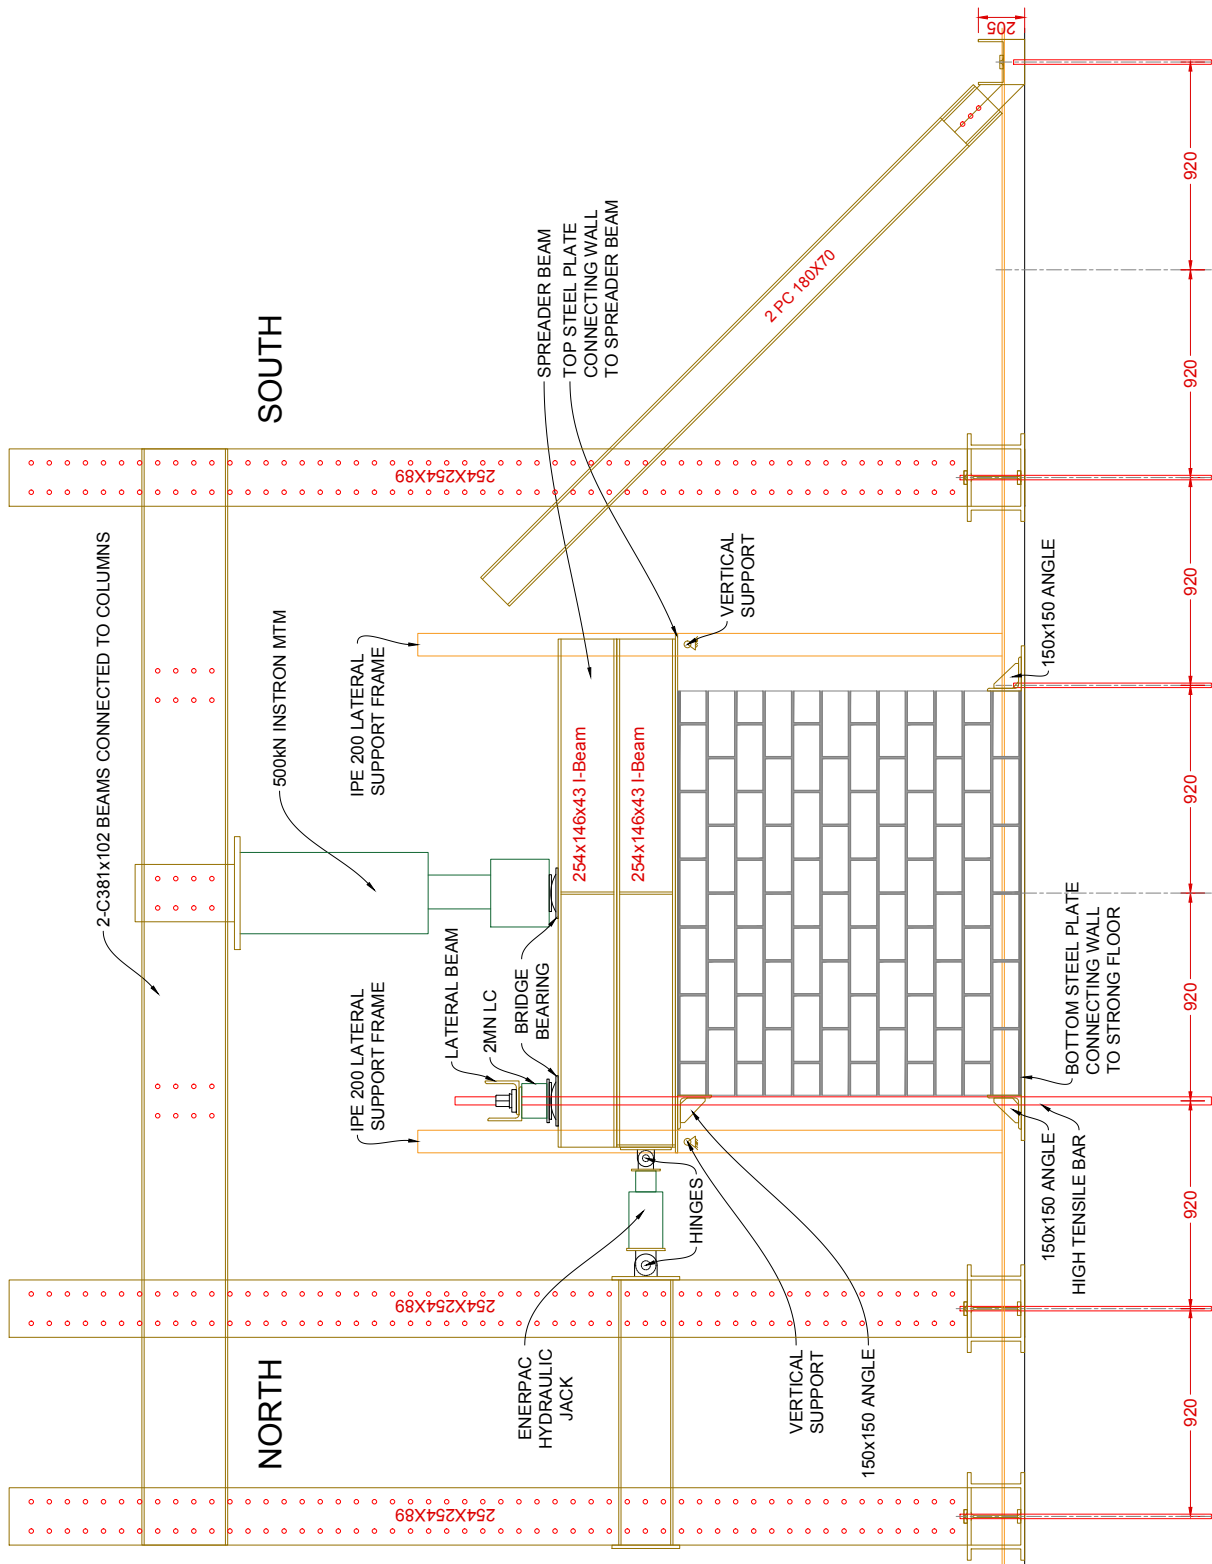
New Test Set-up Proposal (all dimensions in mm)
